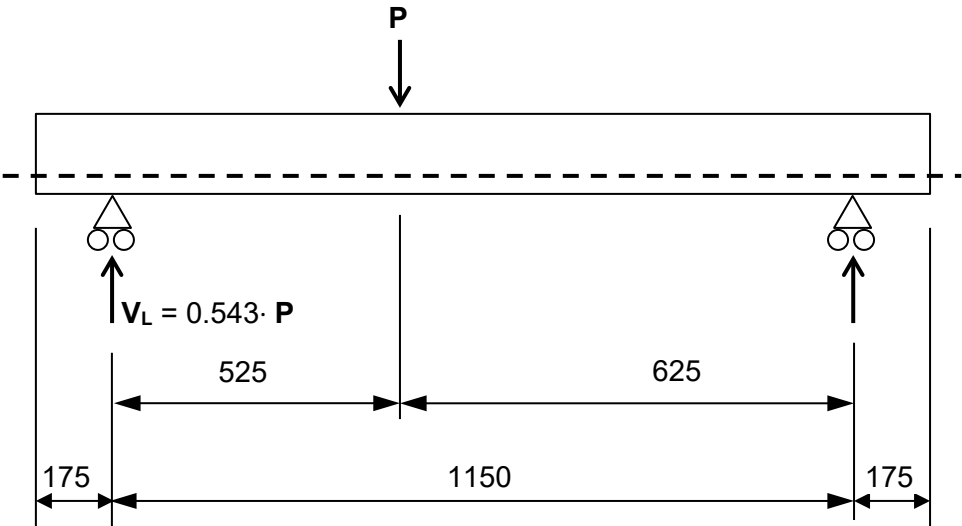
The point load P and maximum shear force V_L at failure
